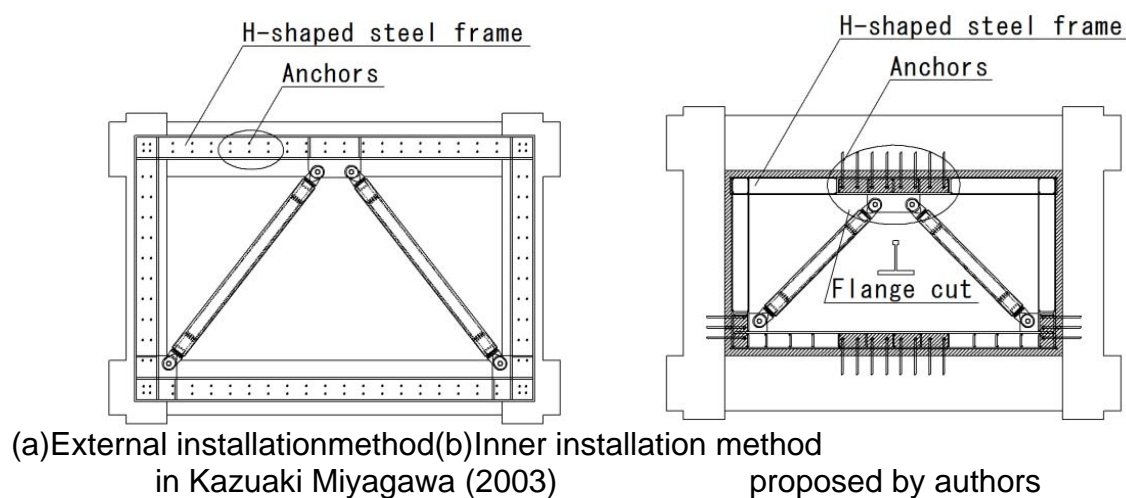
A seismic retrofitting method using the pin-ended doubly circular hollow tube brace
